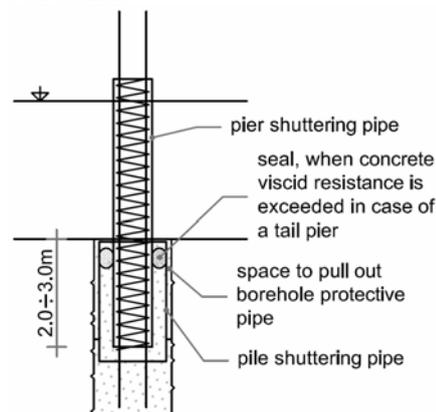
Execution of underwater joint using shuttering pipe of both pier and pile
